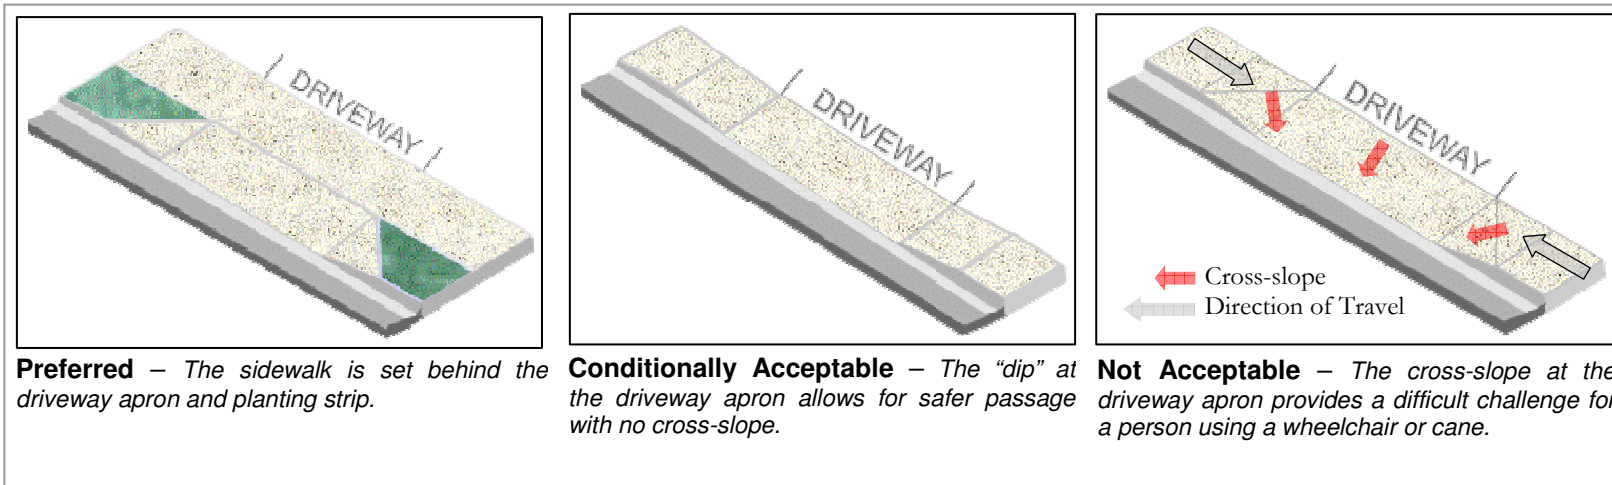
Examples of acceptable and unacceptable design solutions for minimizing cross-sloping at a driveway and sidewalk interface.
